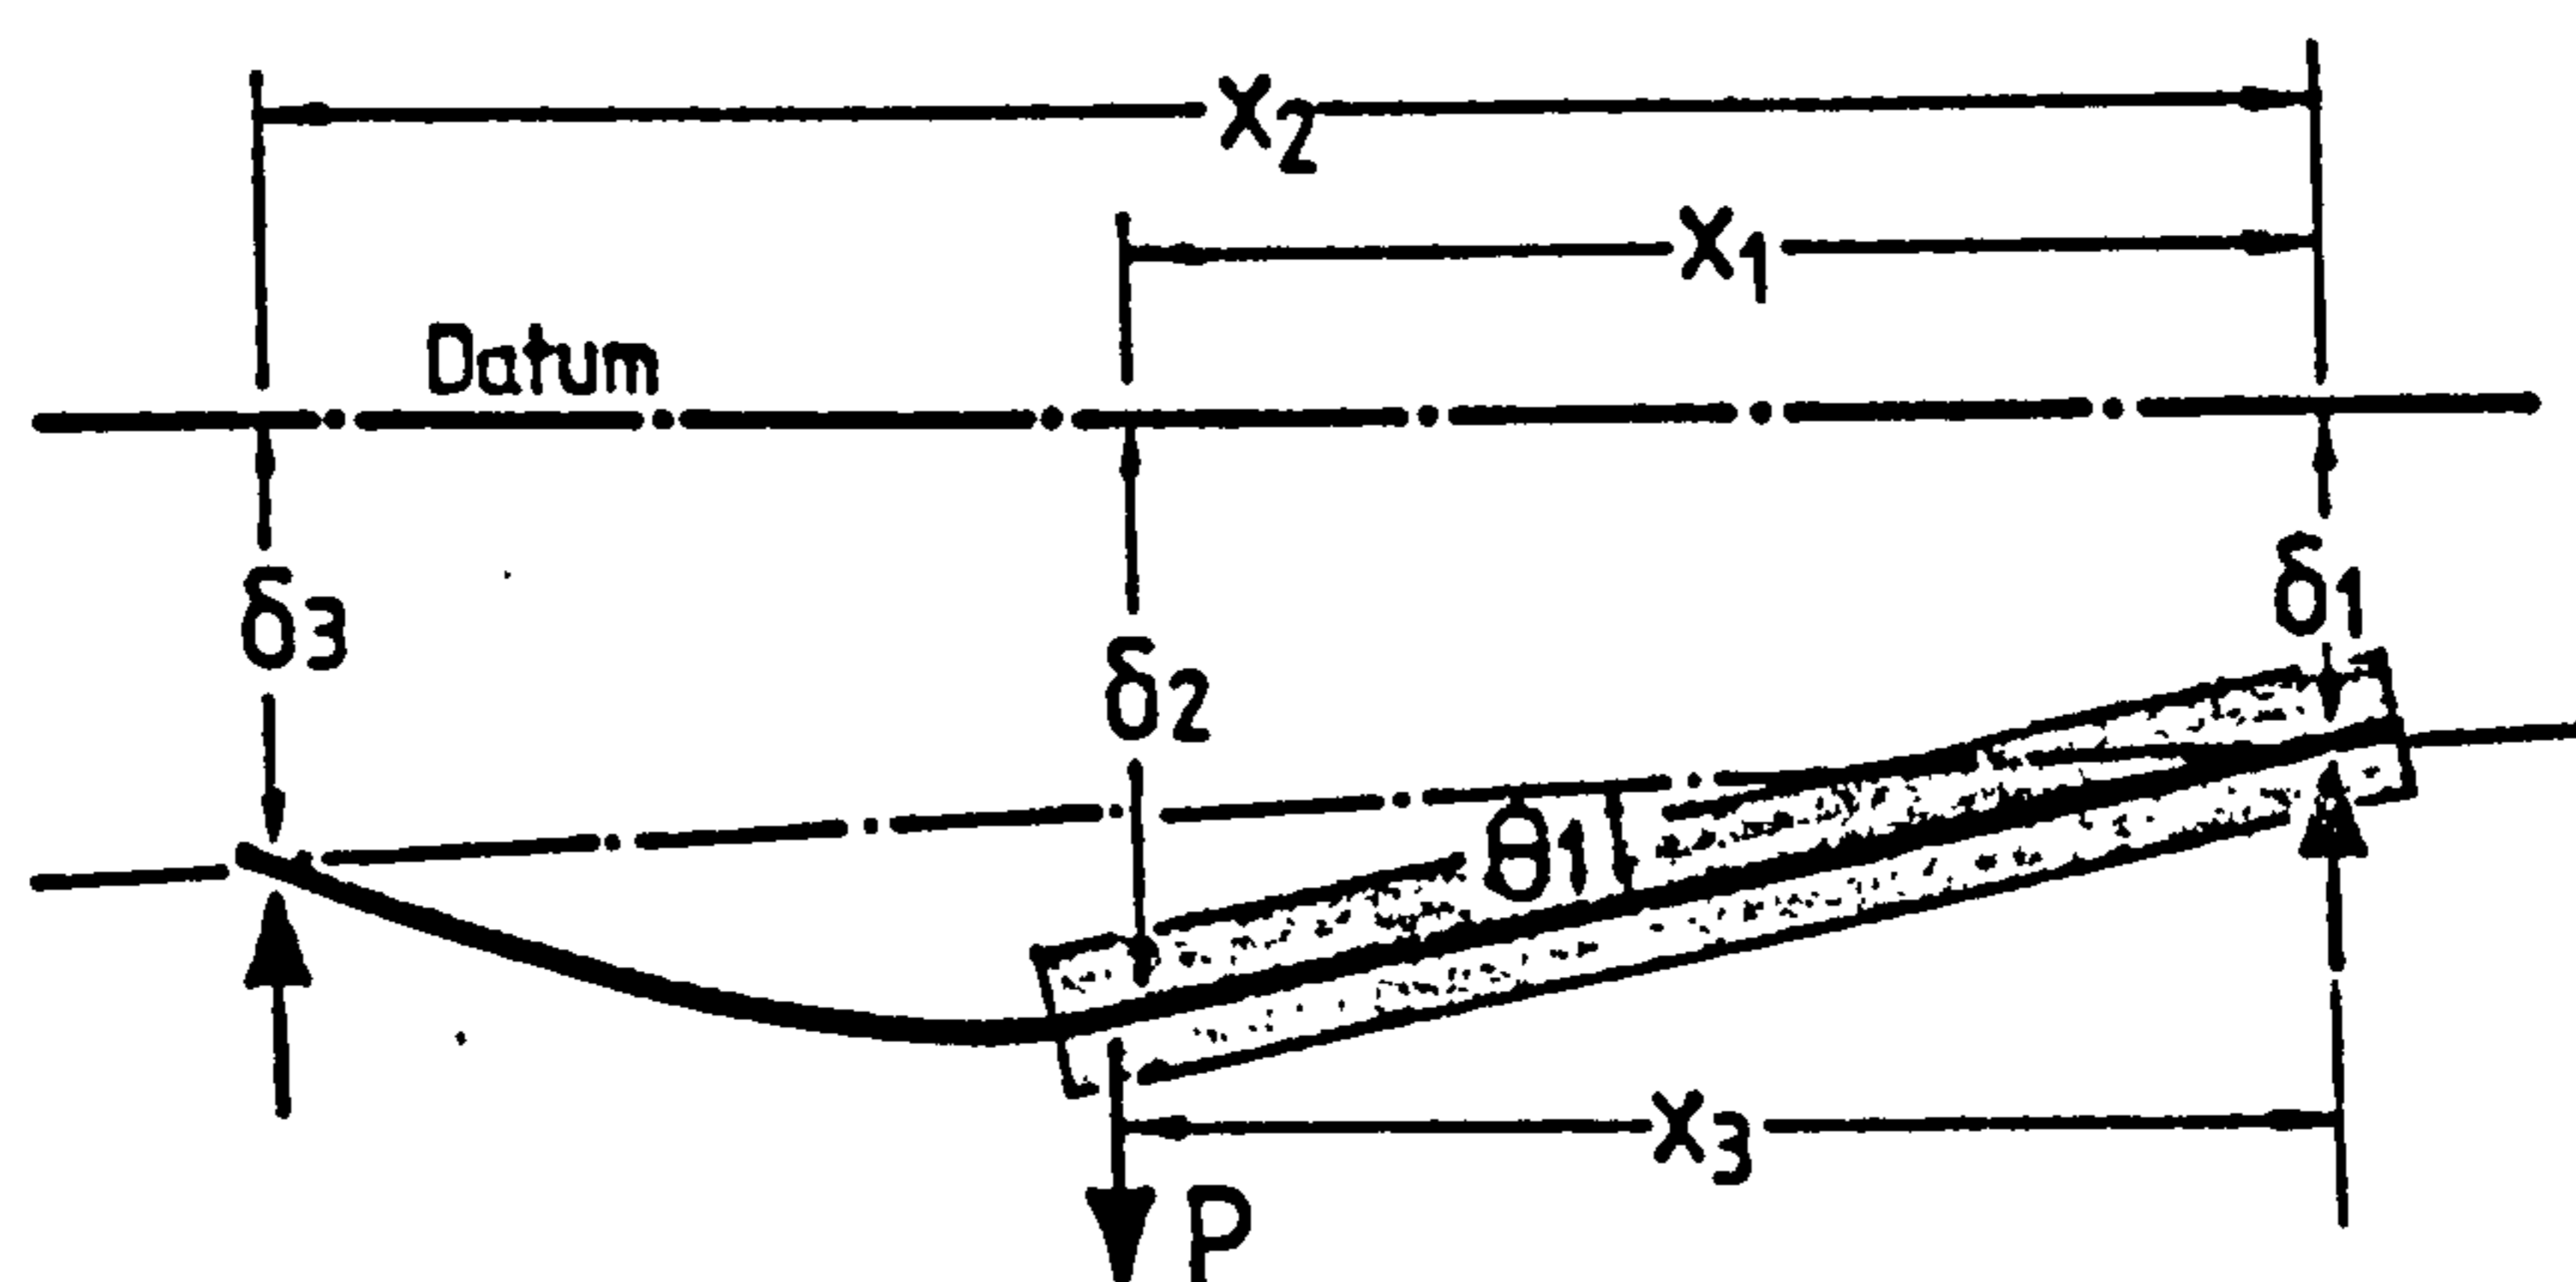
MODEL OF SLAB COUPLING FLANGED WALLS UNDER TEST
